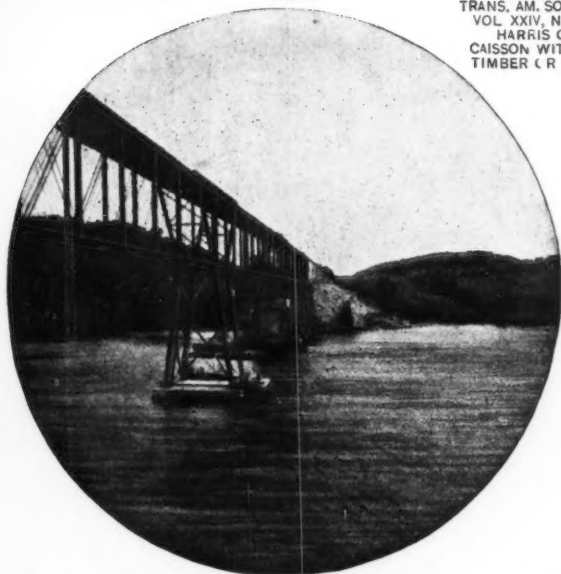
is a view of Croton Lake Bridge upon iron towers, as it was previous to 1889, and before the northerly pier was begun.
